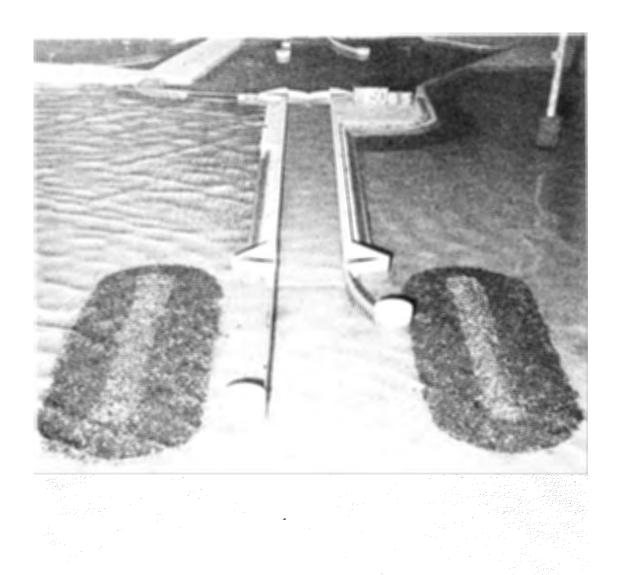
Typical wave natterns at lock entrance for Plan 20A: 3-sec
